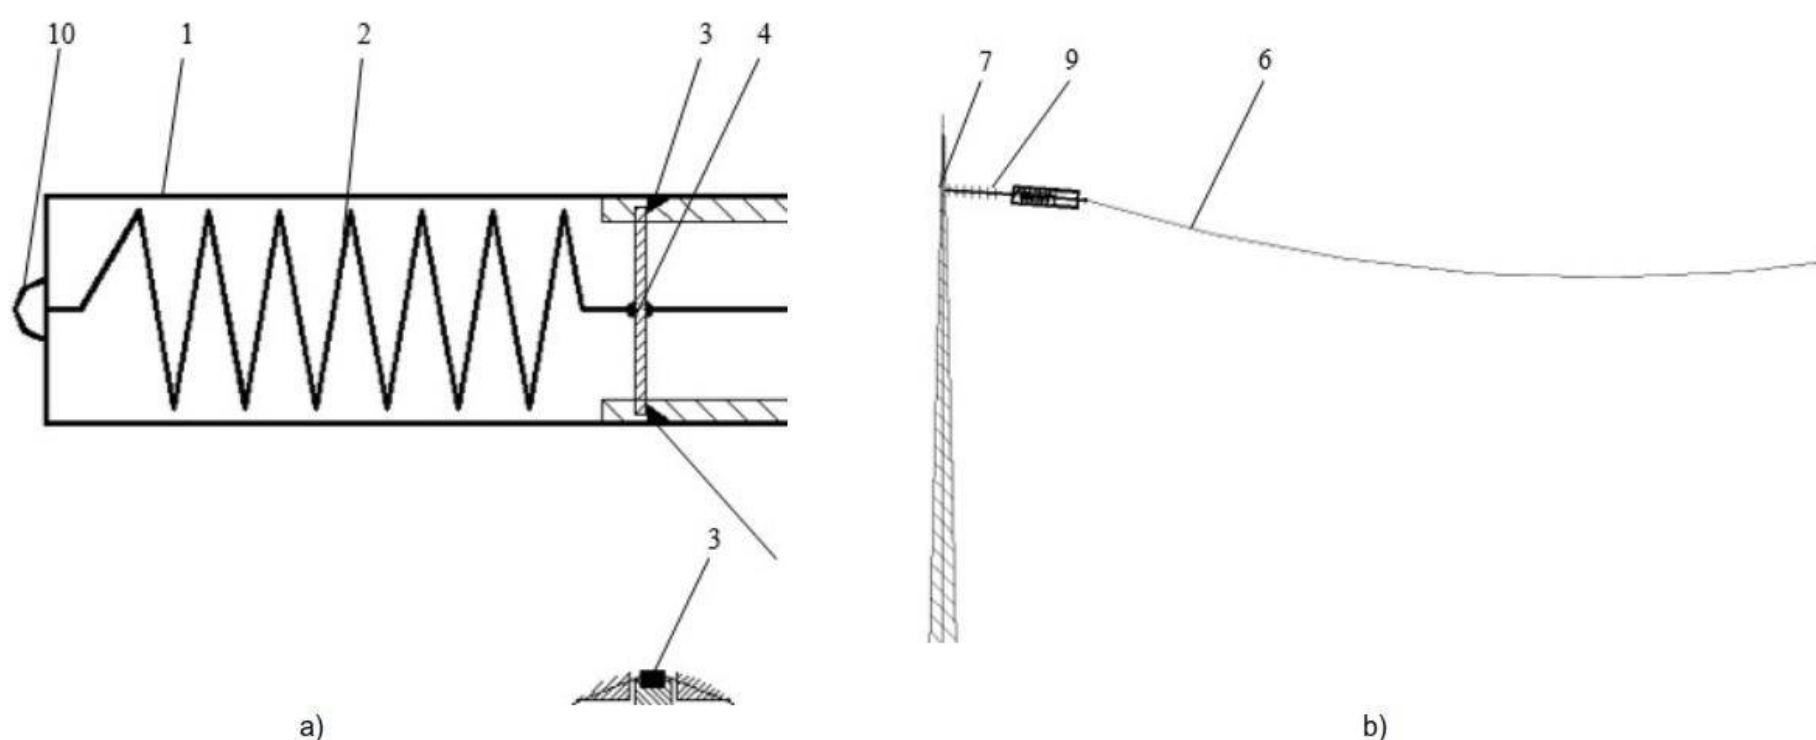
Ice remover device for aerial power lines: a) constructive detail, b) mounting detail
